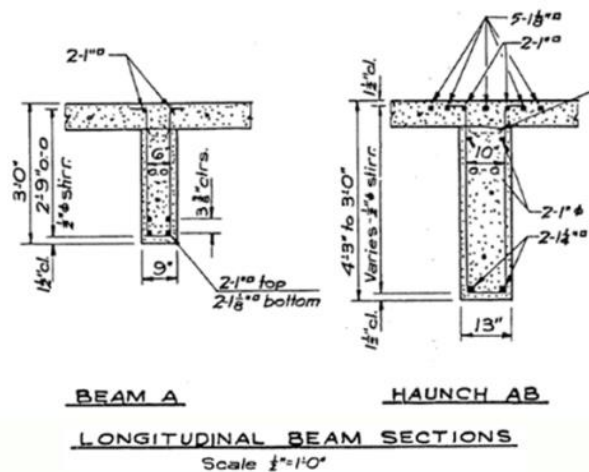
As-built cross section of Mosier Bridge span 1 interior girder (ODOT, 2014)
